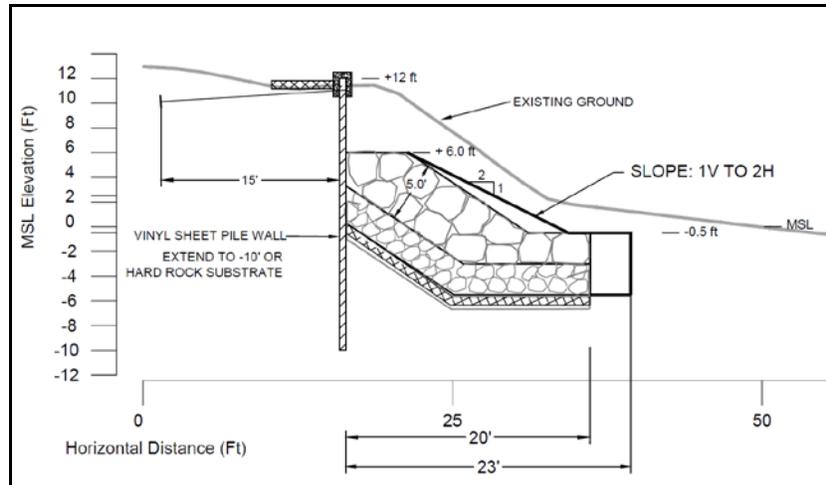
Traditional revetment modification to 1 vertical to 2 horizontal slope
